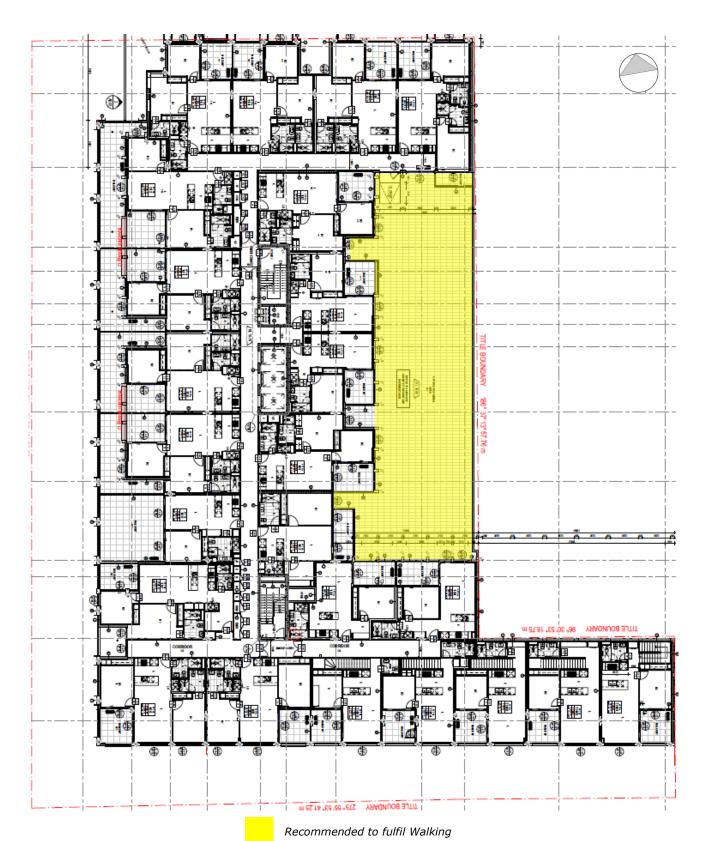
Level 1 floor plan with the recommended wind criteria overlaid.
